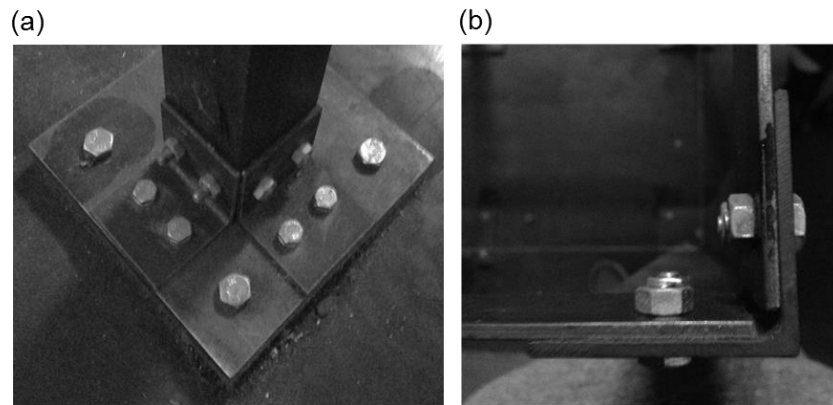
The details of (a) base connection; (b) the details of beam-column connection before the wood plates are mounted.
